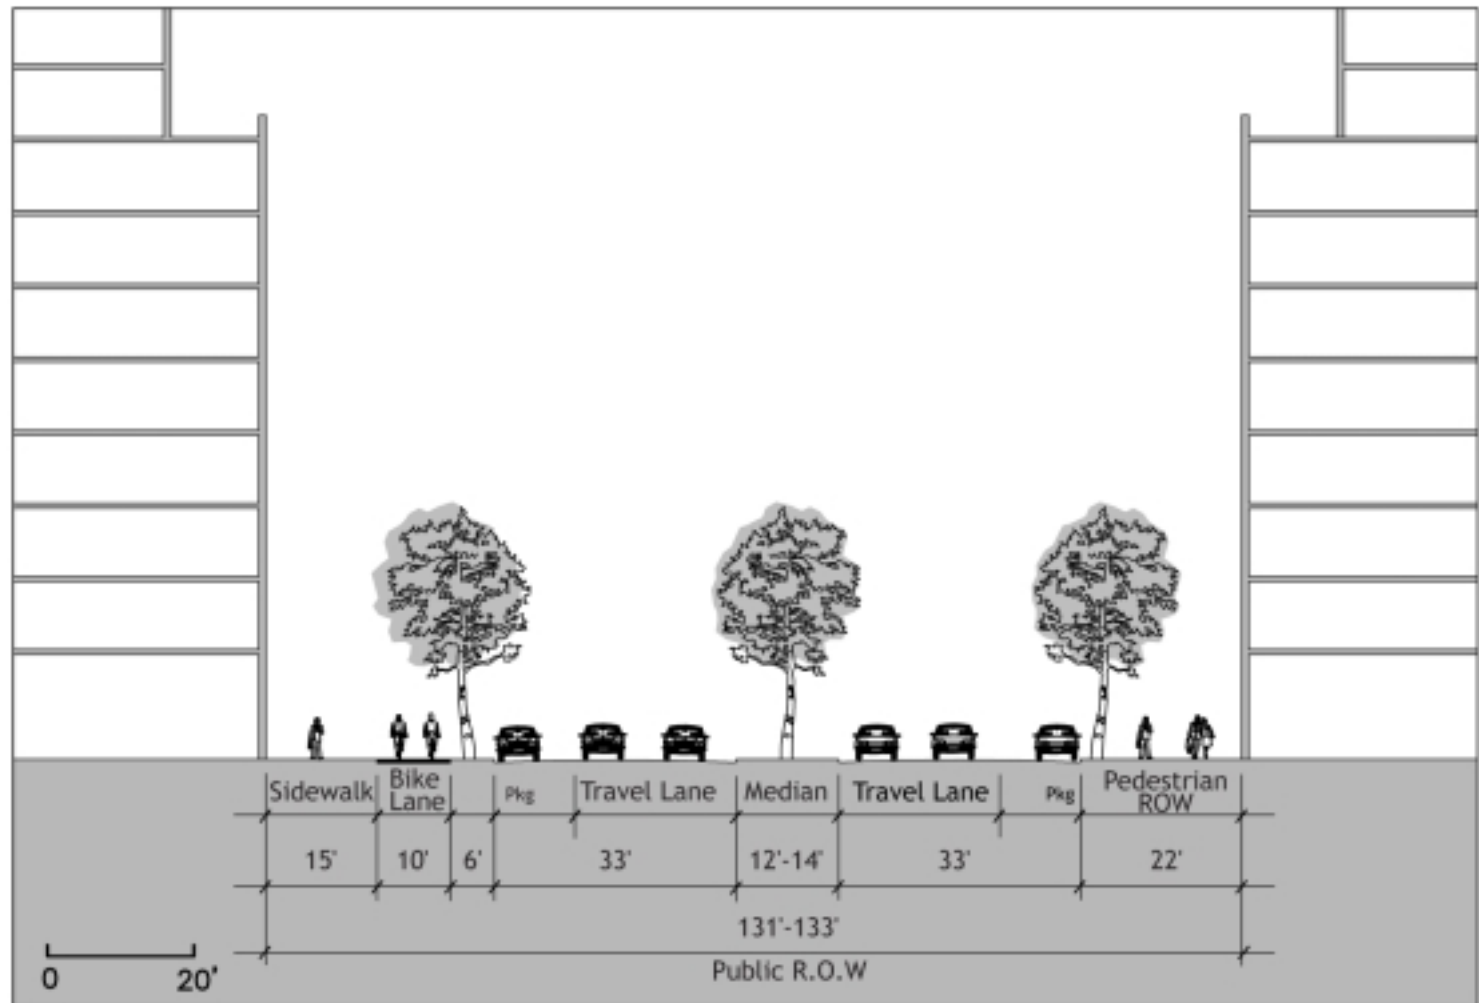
Street Section of Eisenhower Avenue with Bike Lanes
